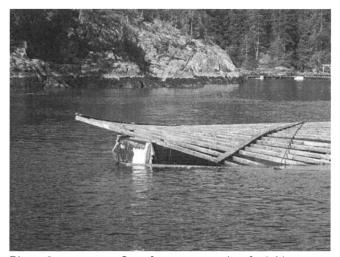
wrap torn, Styrofoam exposed, raft sinking
